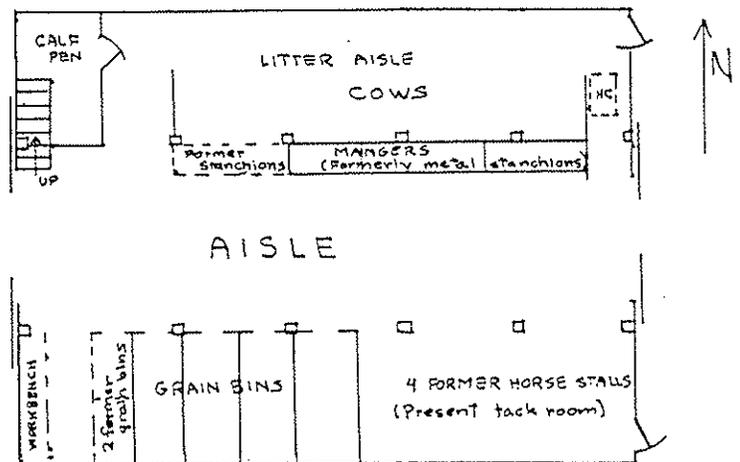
The Frank Pritzing Barn, built in the late 1920s, has a longitudinal 3-aisle plan. (Plan not drawn to scale.)
